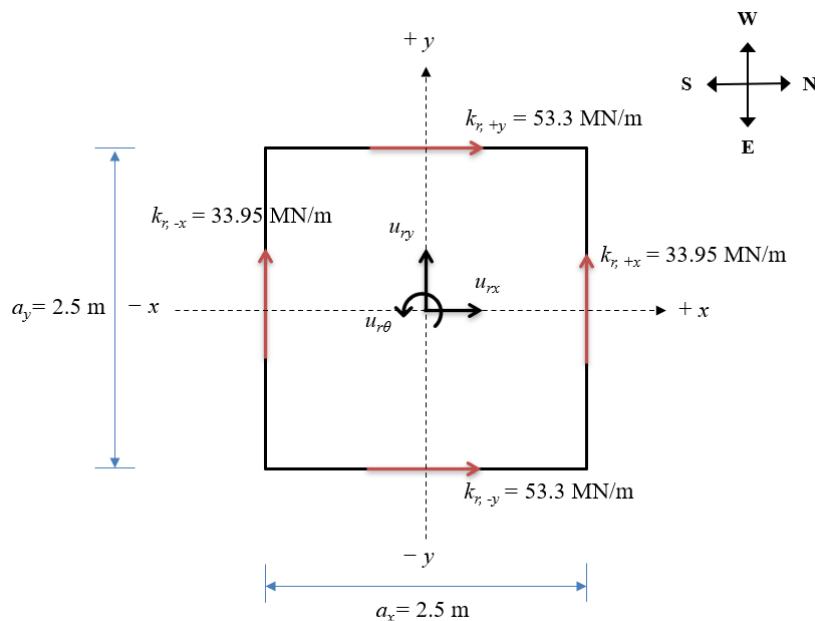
Floor plan of the r^{th} story of the 3D 12-DOF torsional shear building model
